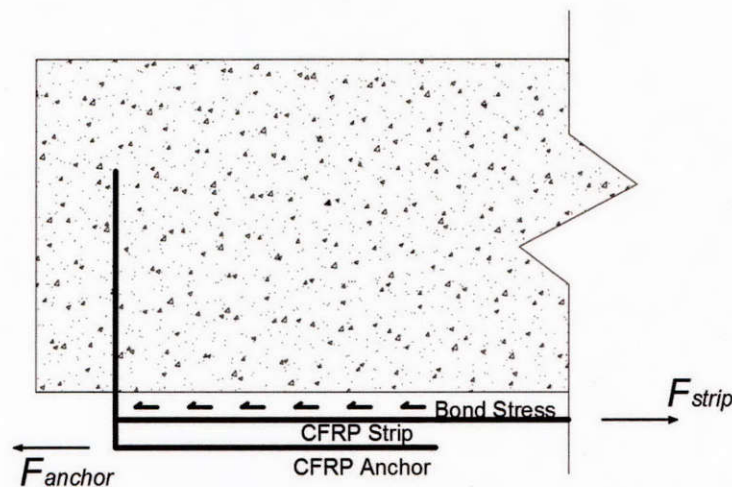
Load transfer from CFRP strip to CFRP anchor and concrete
